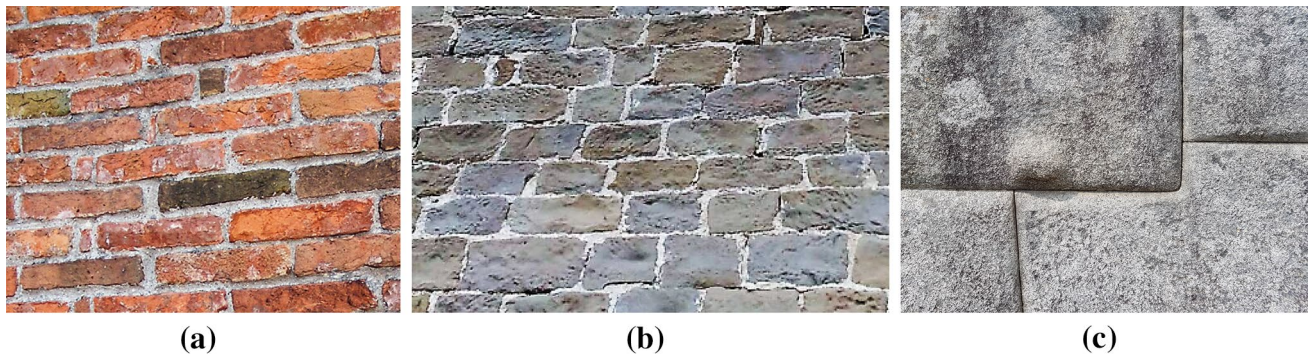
Examples of masonry: a brick masonry, b stone masonry and c Inca's masonry (dry stone masonry)
